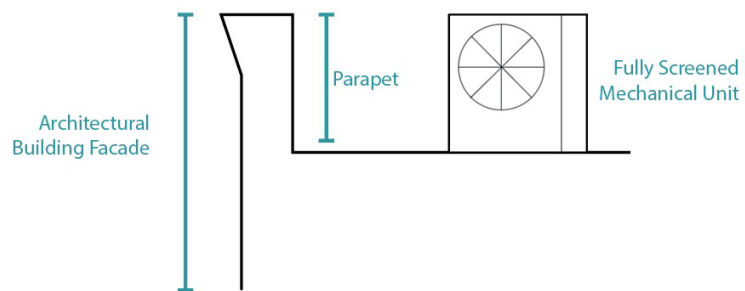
Illustration of rooftop mechanical units screened by parapet
